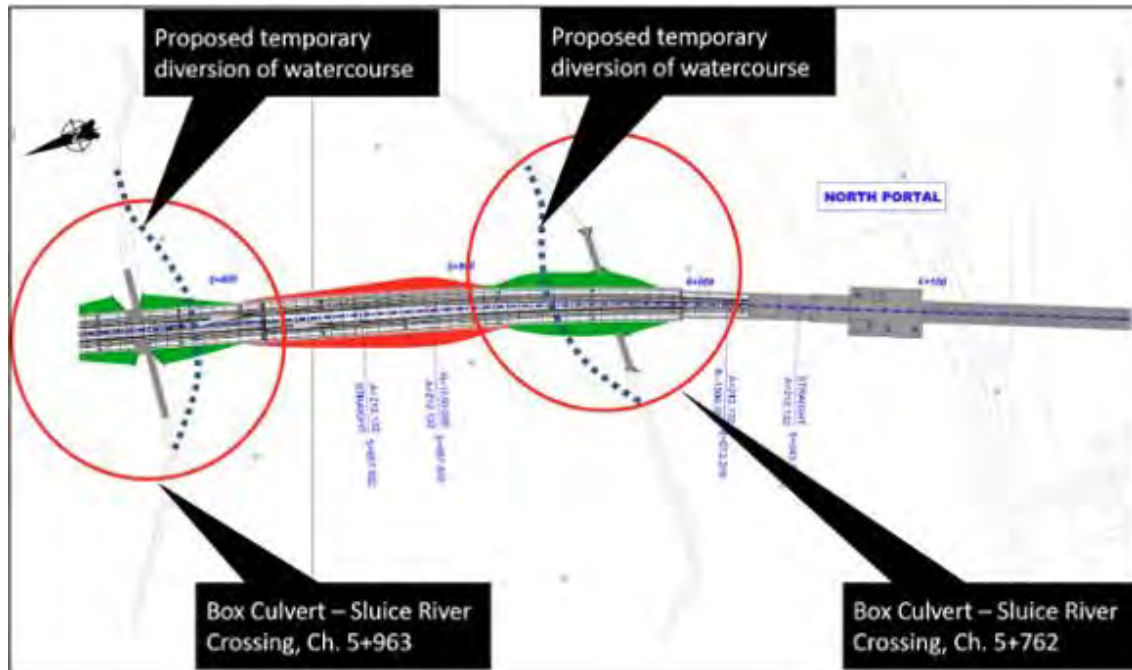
Proposed Culvert Works - Sluice River Crossing
